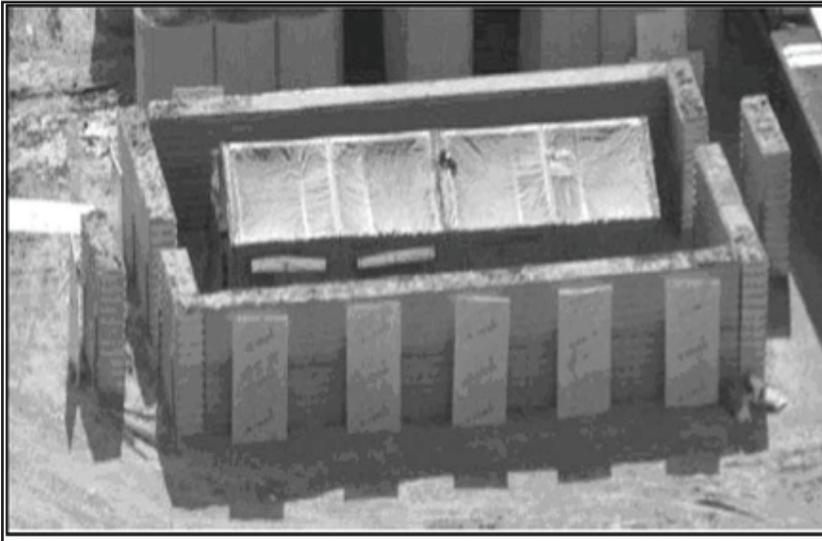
Soil-filled Metal Containers Used for Sidewall Protection
